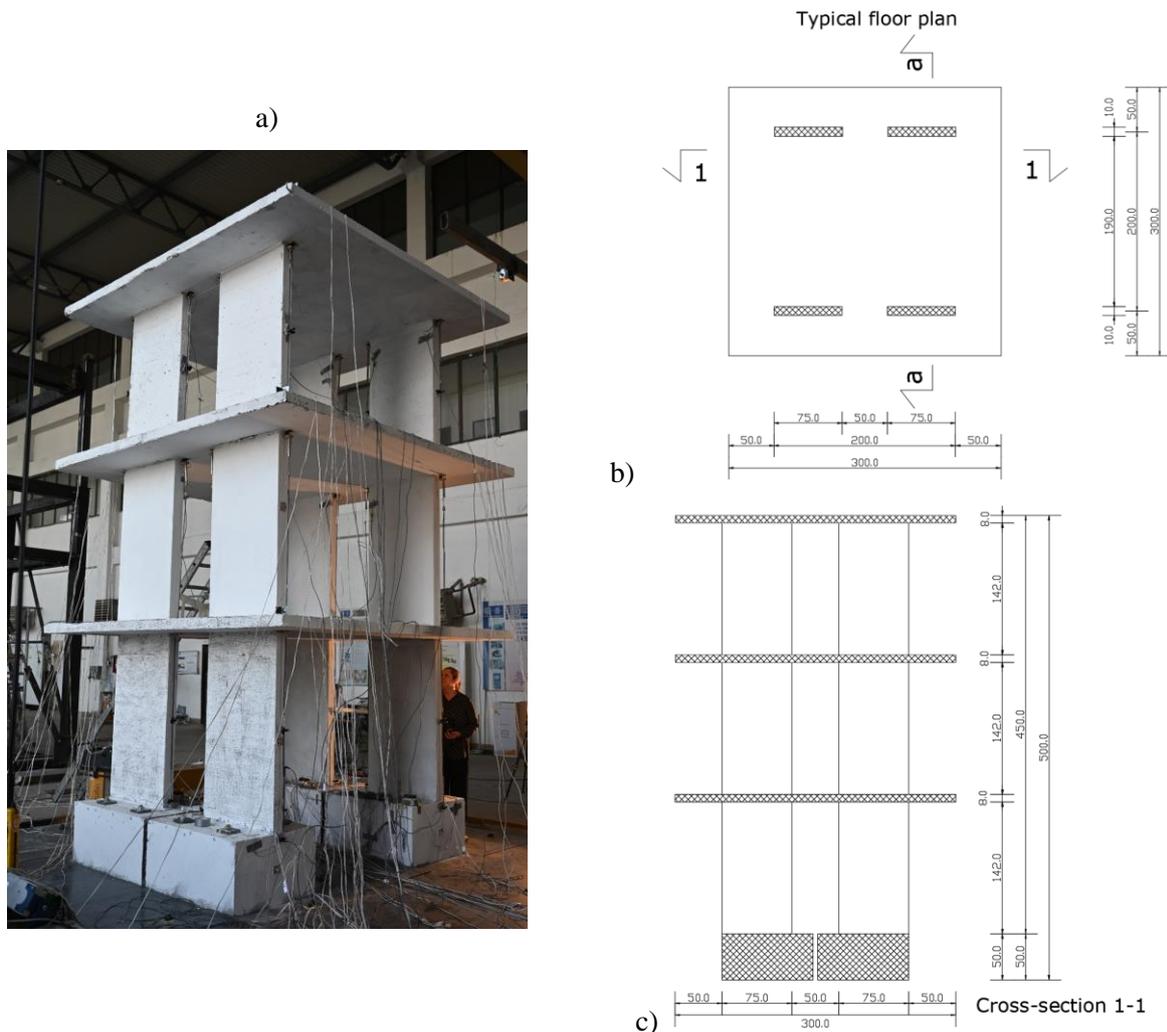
The specimen and its geometry: a) the appearance, b) floor plan, c) side view
